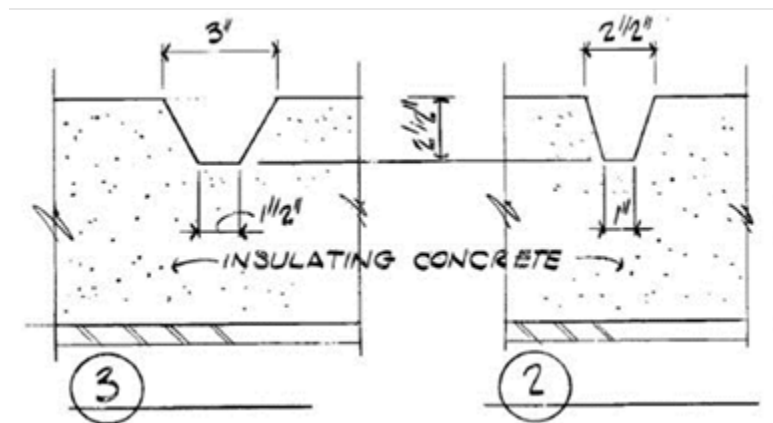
241-AZ/SY/AW/AN/AP Tank Farm Air Slot Cross Sectional Detail
